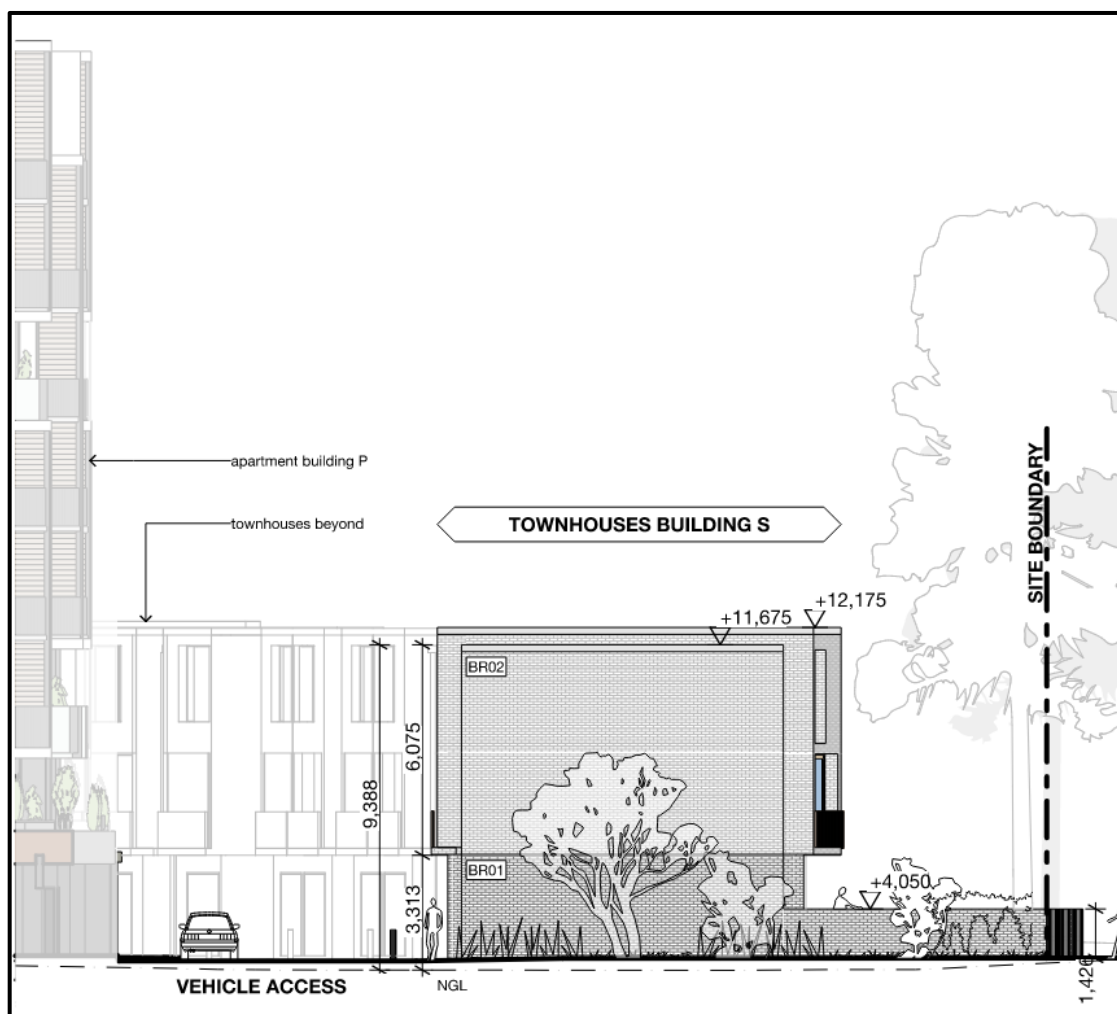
The eastern elevation of Building S showing the separation between the townhouse facing the streetscape and the medium rise apartments forming the 'inner circle' of buildings.
